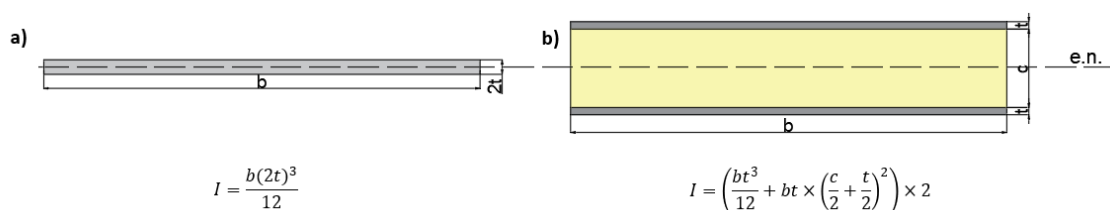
Relation between inertia moments: a) Rectangular section; b) Sandwich construction element section.
